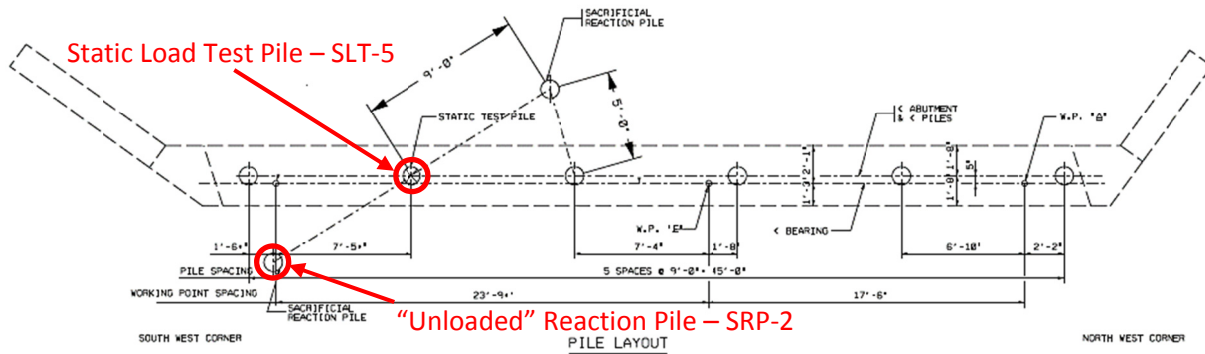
A load test performed on BR 83040 provided a monitoring opportunity for dragload comparisons between a structural loaded pile and a pile without top loads. A sacrificial pile on the exterior of the abutment was needed for the load test; when it was abandoned, it was outfitted with strain gages at the same elevations as the load test pile and filled with concrete.
